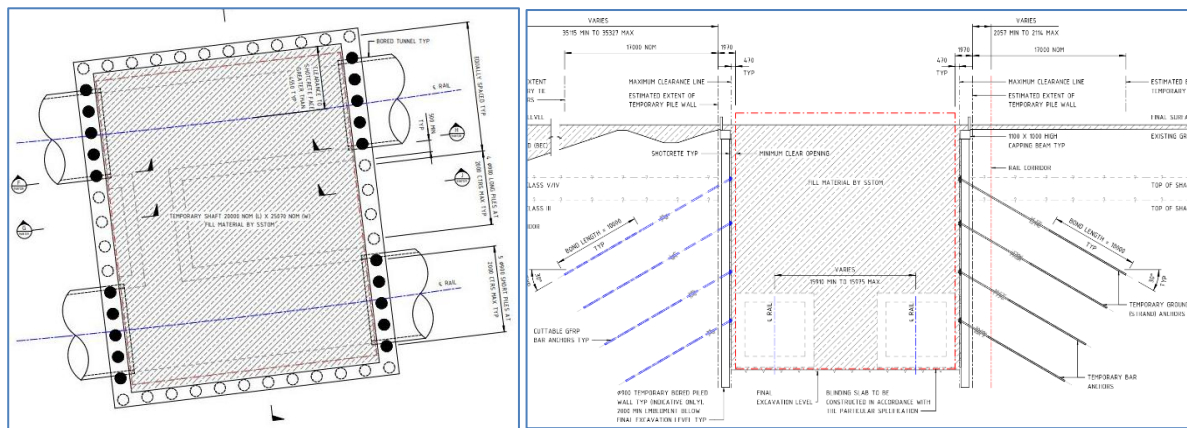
TBM Service Shaft - Reference Design plan and cross section
